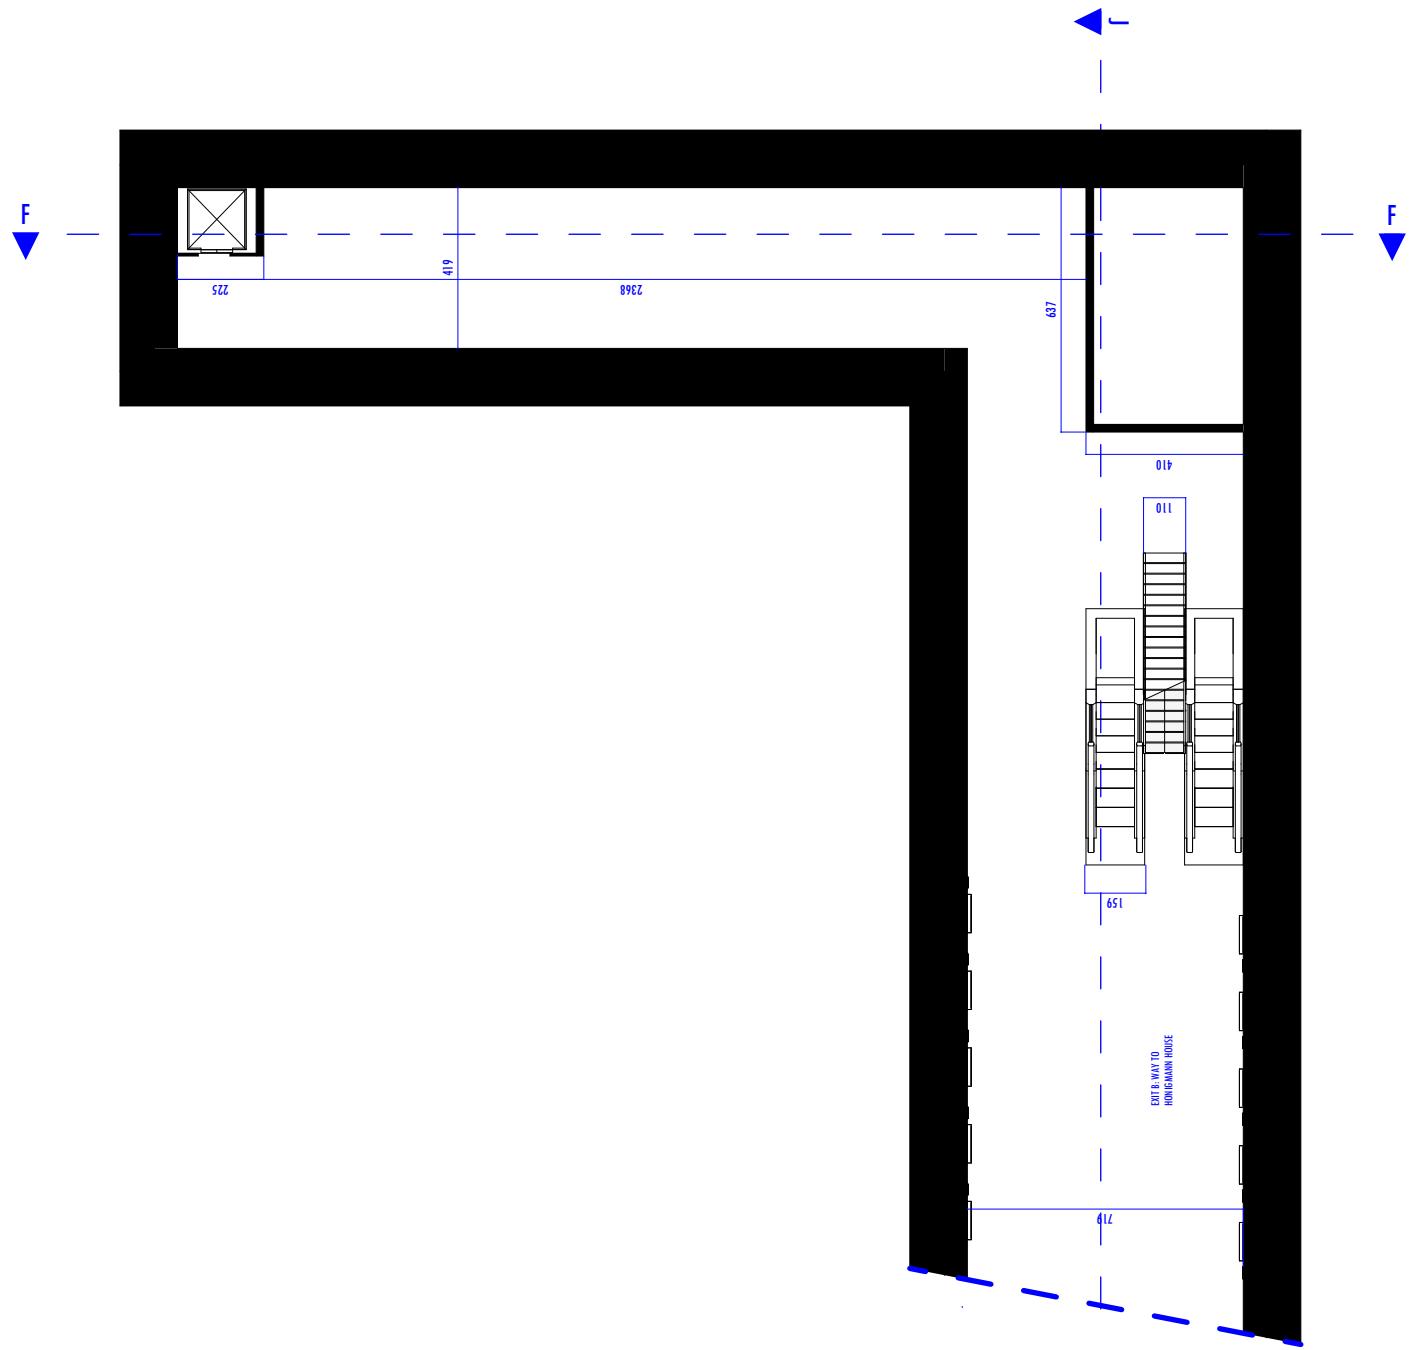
Ticketing floor - Exit B to Honigmann House (-9.44m)
